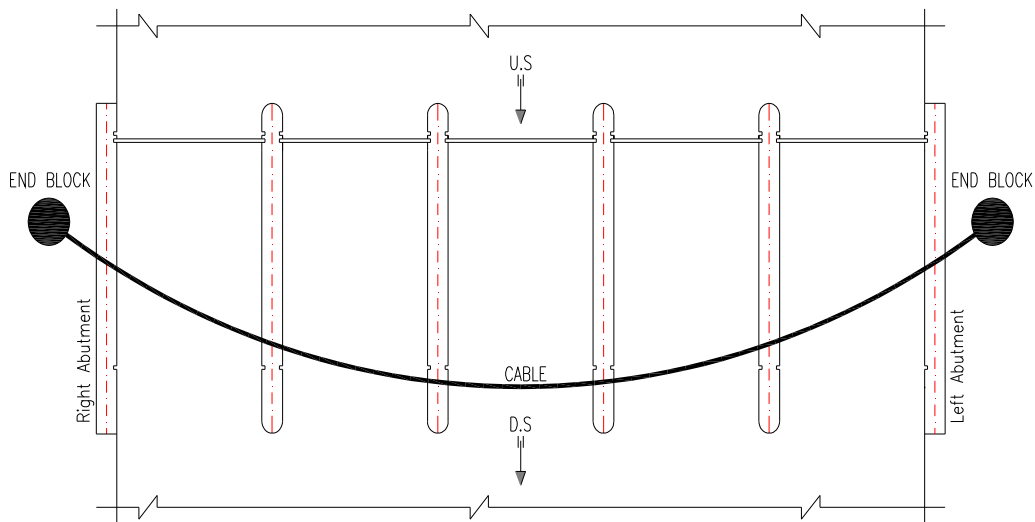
Schematic Drawing for Cable Profile (Barrage Plan without Bridge Drawn)
